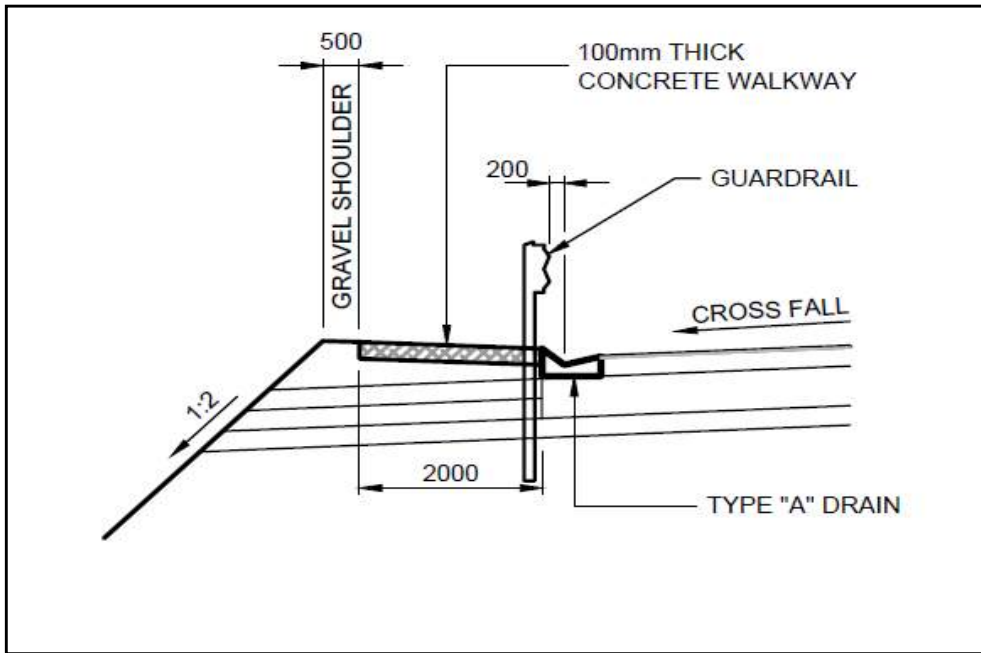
Intersection Widening – High Fill Condition (Note: Final pavement layer works – refer Section 8).
